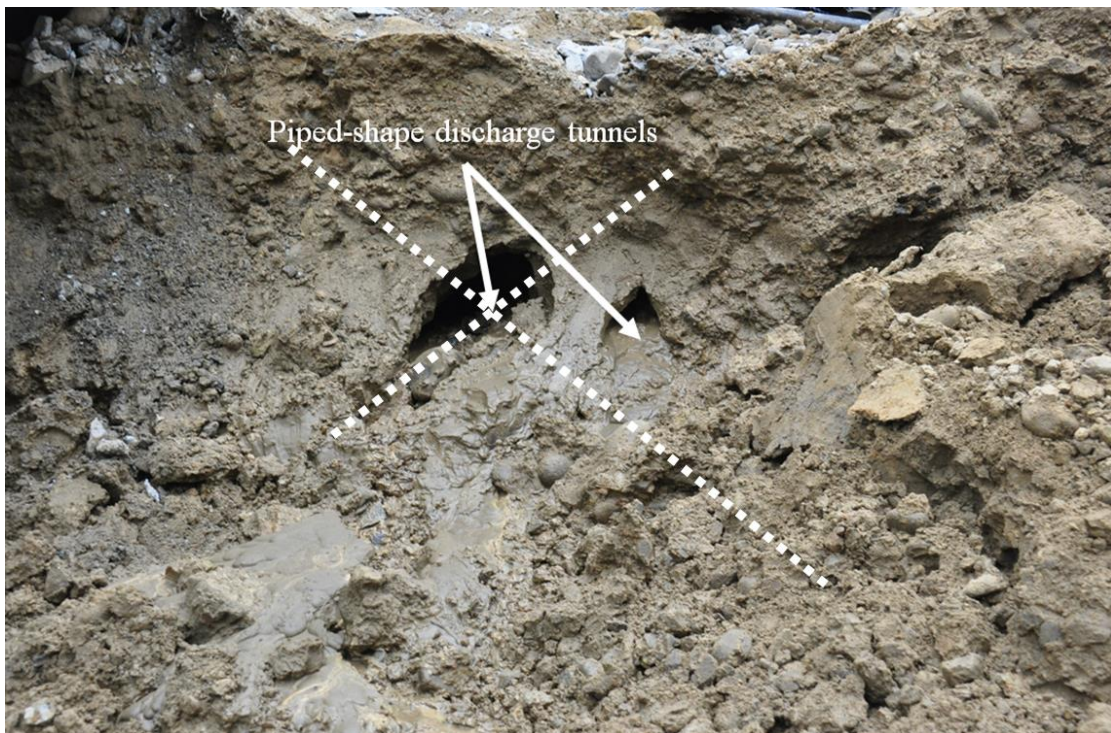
Pipe-shaped tunnel formed in the intersection area of shear textures of Renyitan Reservoir spillway
